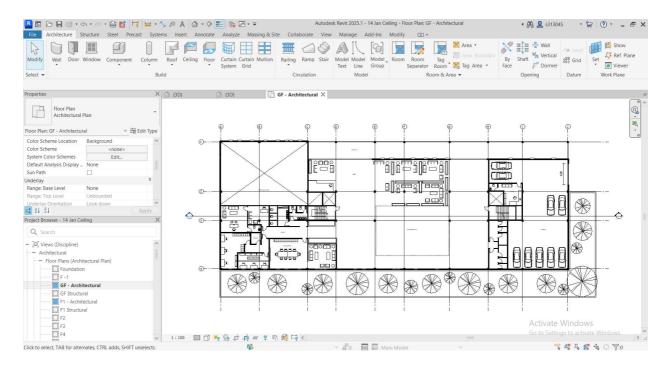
Ground floor plan in Revit before applying changes, Elaborated by Authors
